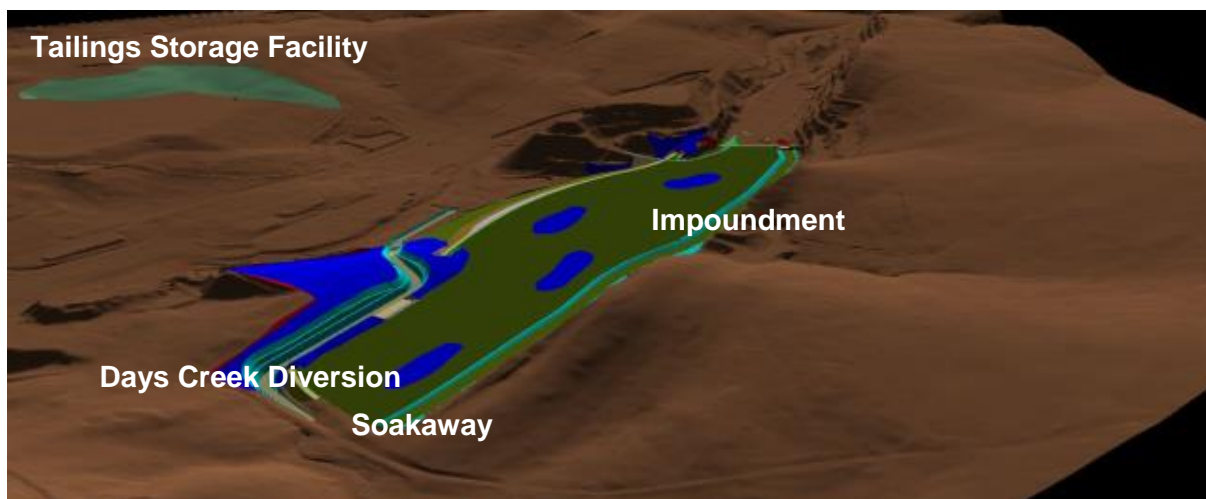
Looking south-east over the impoundment with the remnant Tailings Storage Facility in the background.
